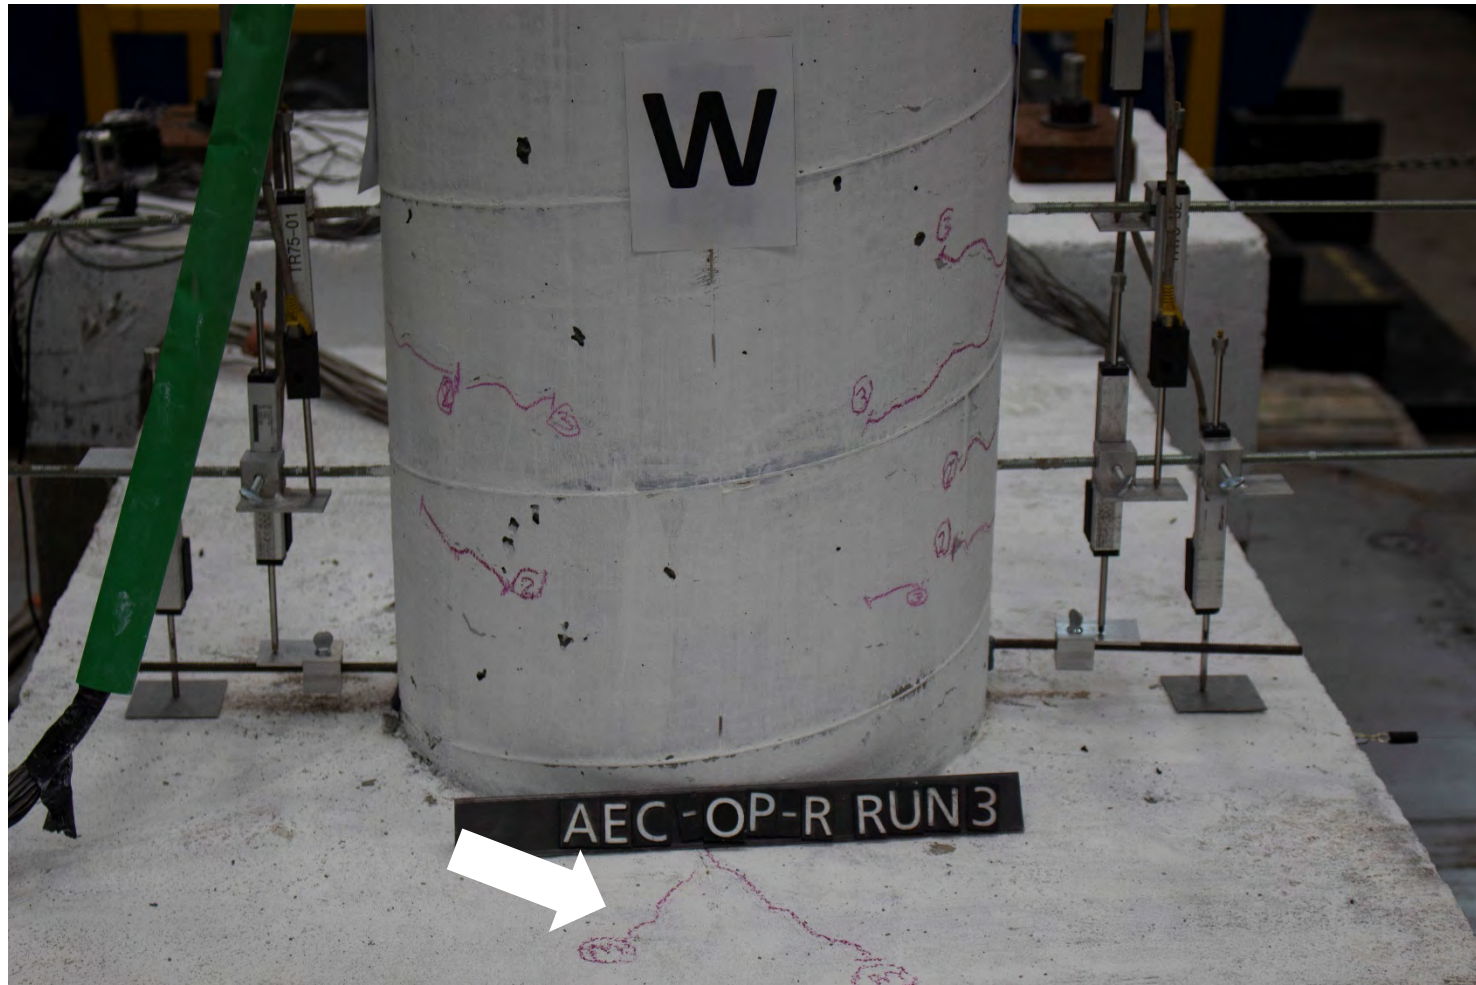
Shear cracks on the cap beam (run #3)
